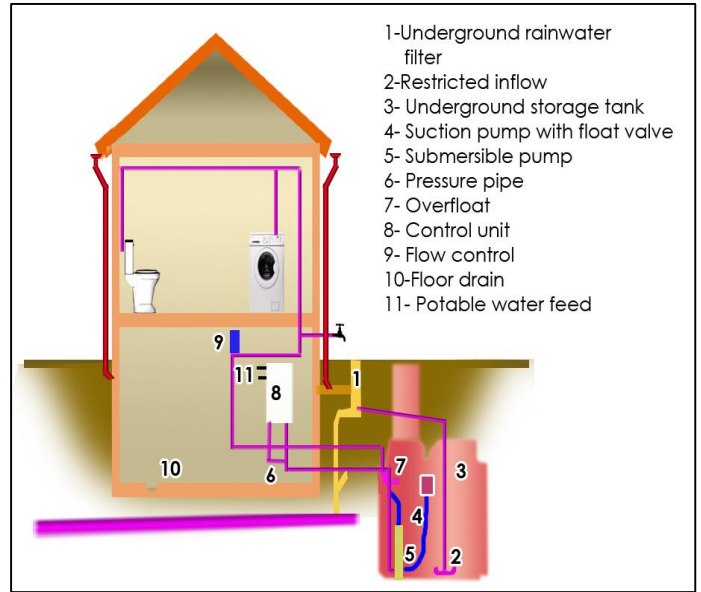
Typical Underground Storage Tank with Submersible Pump.
